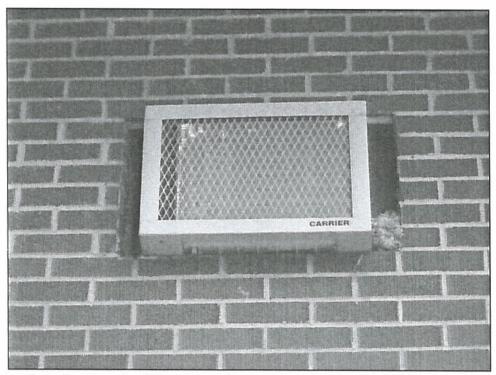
Oversized Opening at Ground Floor AC Near Northeast Corner of Addition
